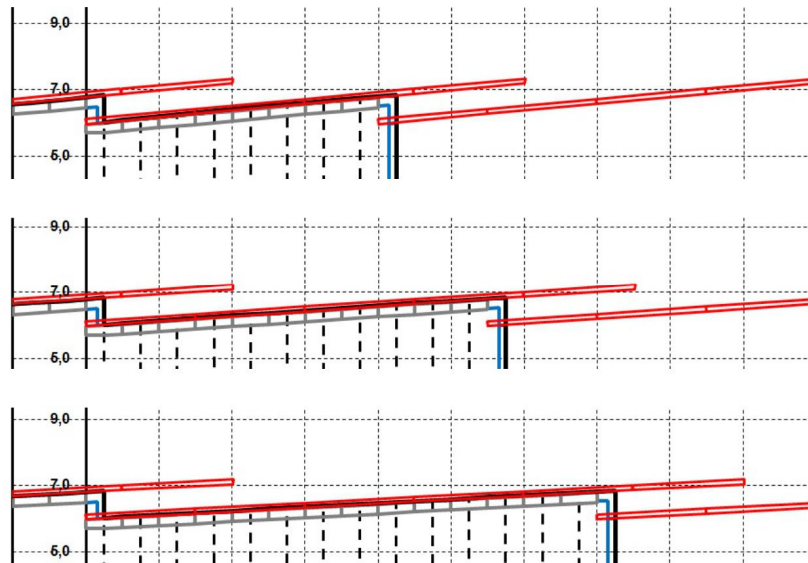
longitudinal sketch of 12 m, 15 m, and 18 m installation length.
